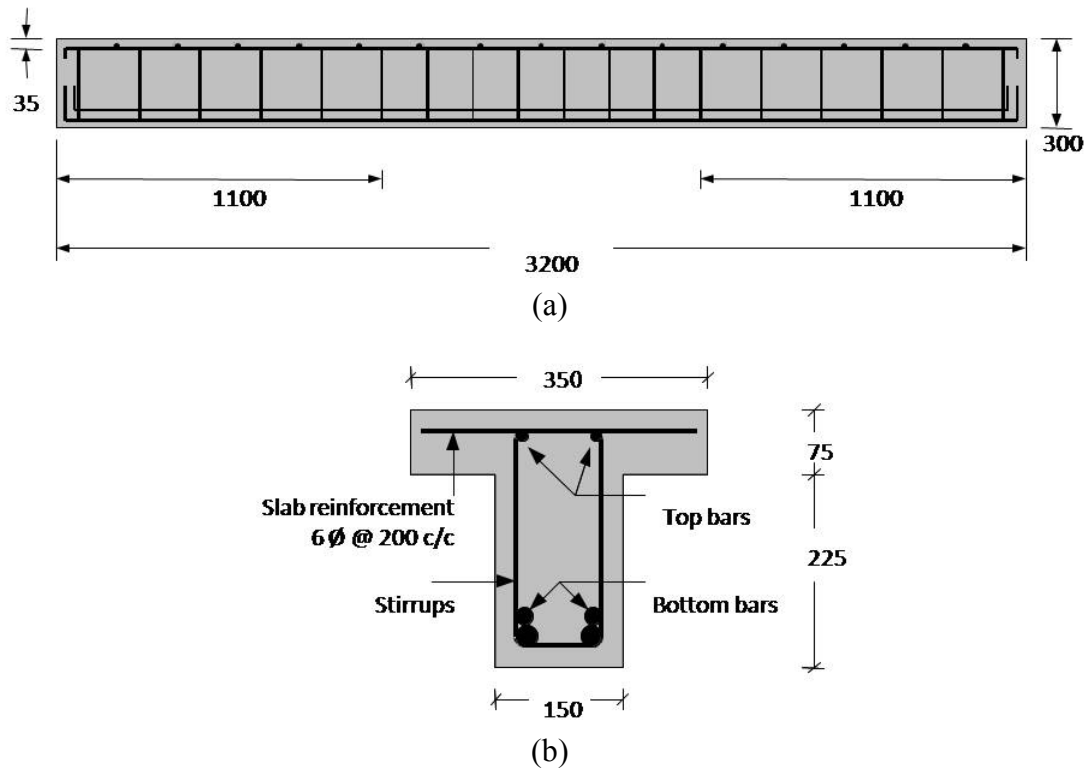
Sectional details for reference beam specimen (all dimensions are in mm): (a) sectional elevation; (b) cross-section
